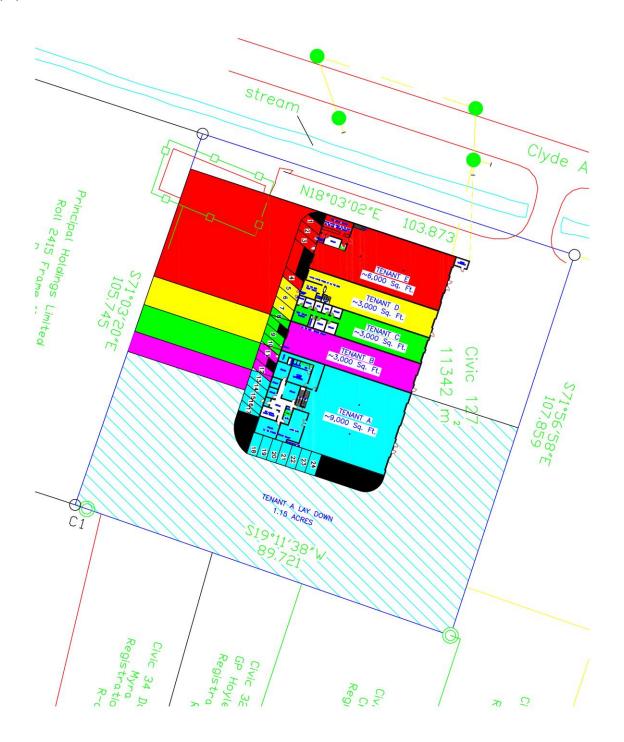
127 Clyde Avenue Building Layout Tenant A – Hydril Canadian Company LP
